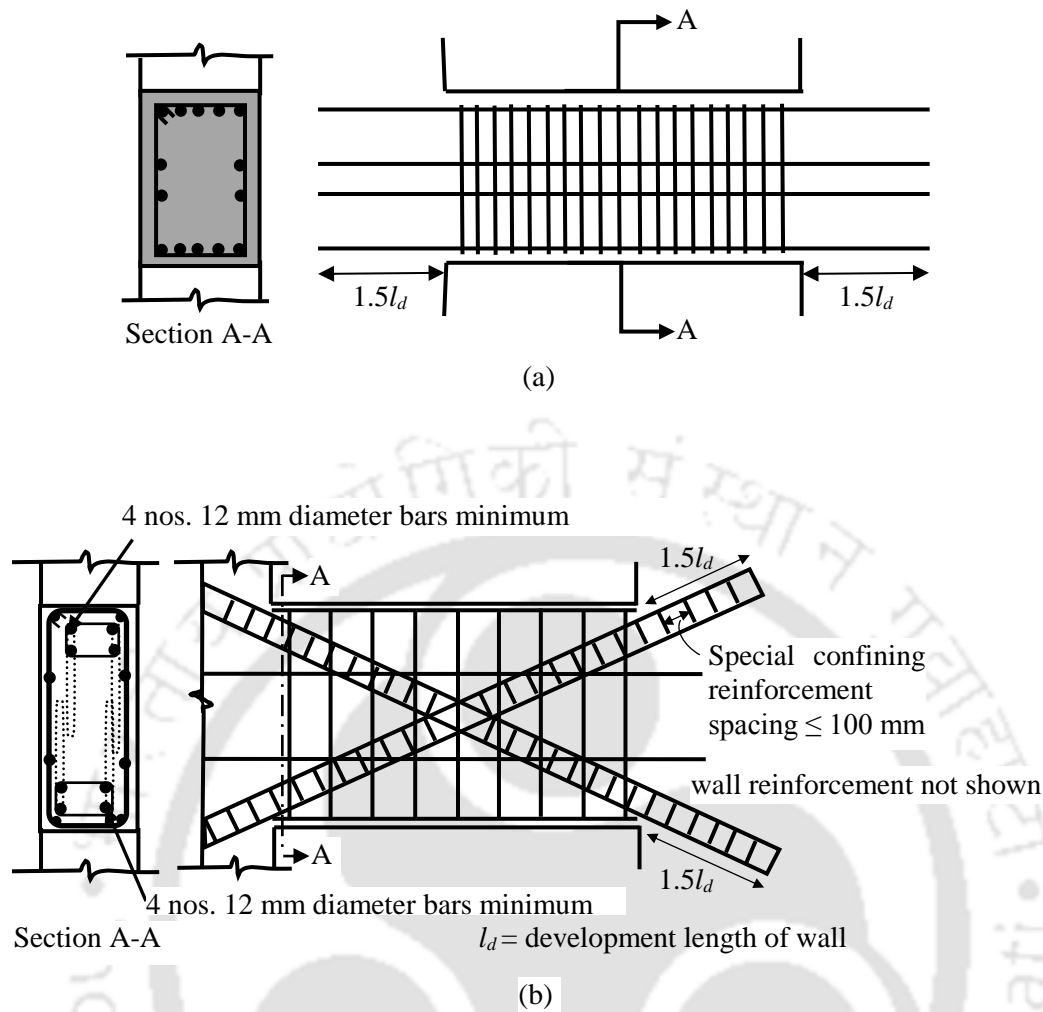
Typical reinforcement details for coupling beam: (a) parallel reinforcement and (b) diagonal reinforcement as per IS: 13920-2016 (Medhekar and Jain, 1993).
